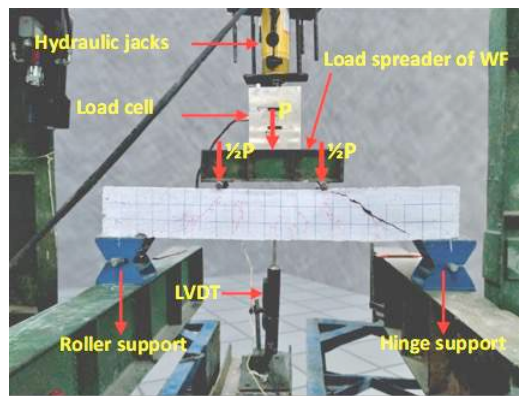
Test arrangement of bamboo-reinforced concrete beams.
